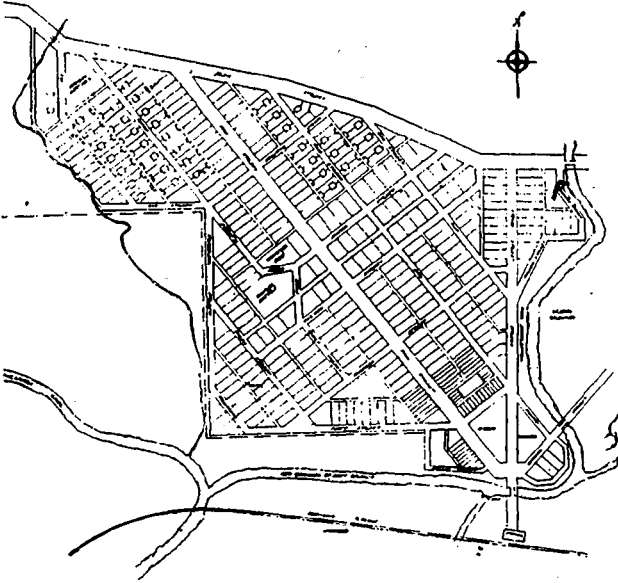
Plan of a Portion of the Town Site of Gwin, showing the Arrangement of the Semi-detached Houses Upon the Lots. Longer Views are Obtained Between Houses by Altering or Staggering the Houses on Either Side of the Street.
